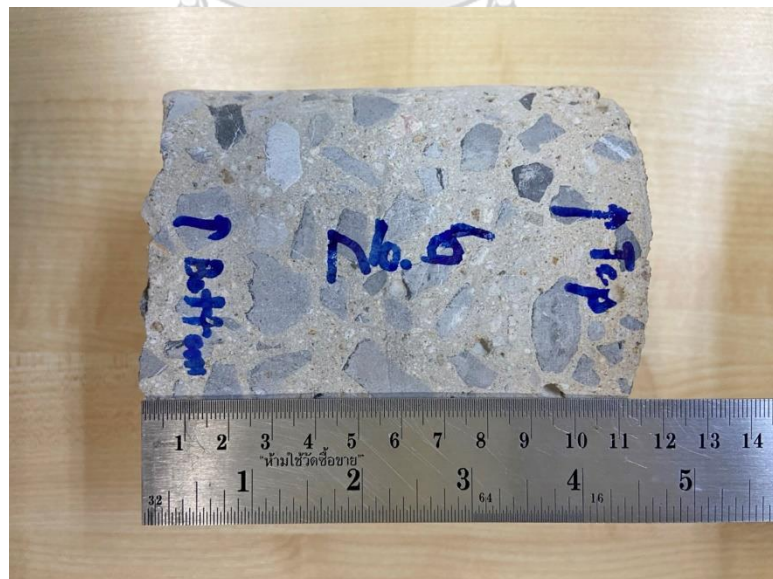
Concrete sample located on bridge span no.6 gridline N-O/5
